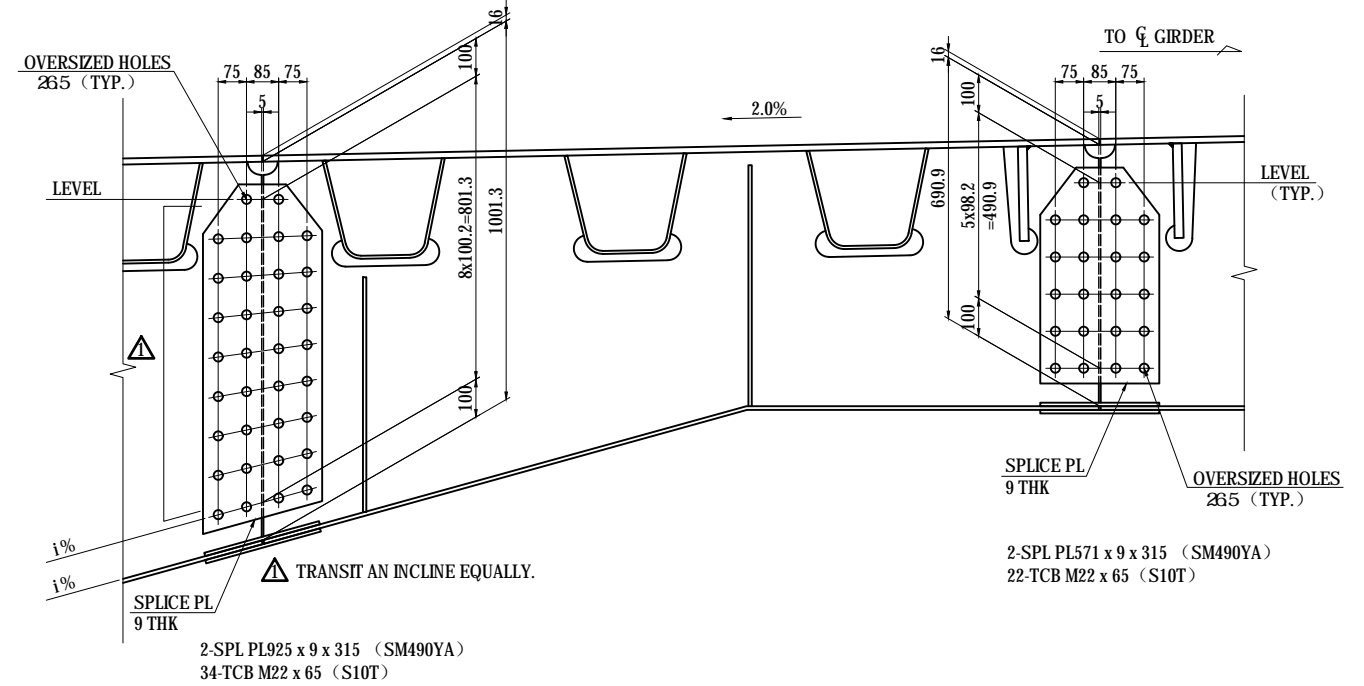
# DETAIL OF MAIN GIRDER STANDARD (6) S=1:20
